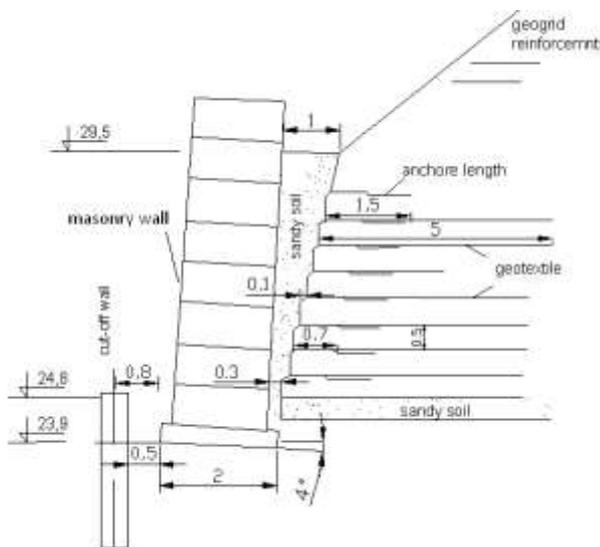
Cross section of retaining wall (Miszowska et al. 2015).
